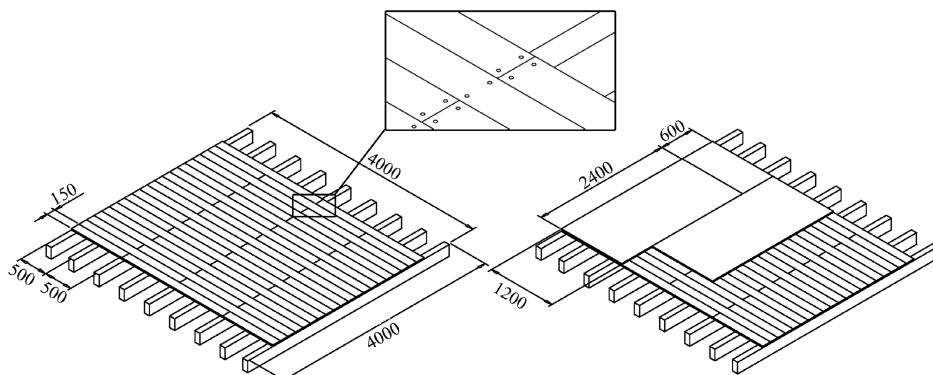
(a) Specimen AB-1 and (b) specimen R-1.
